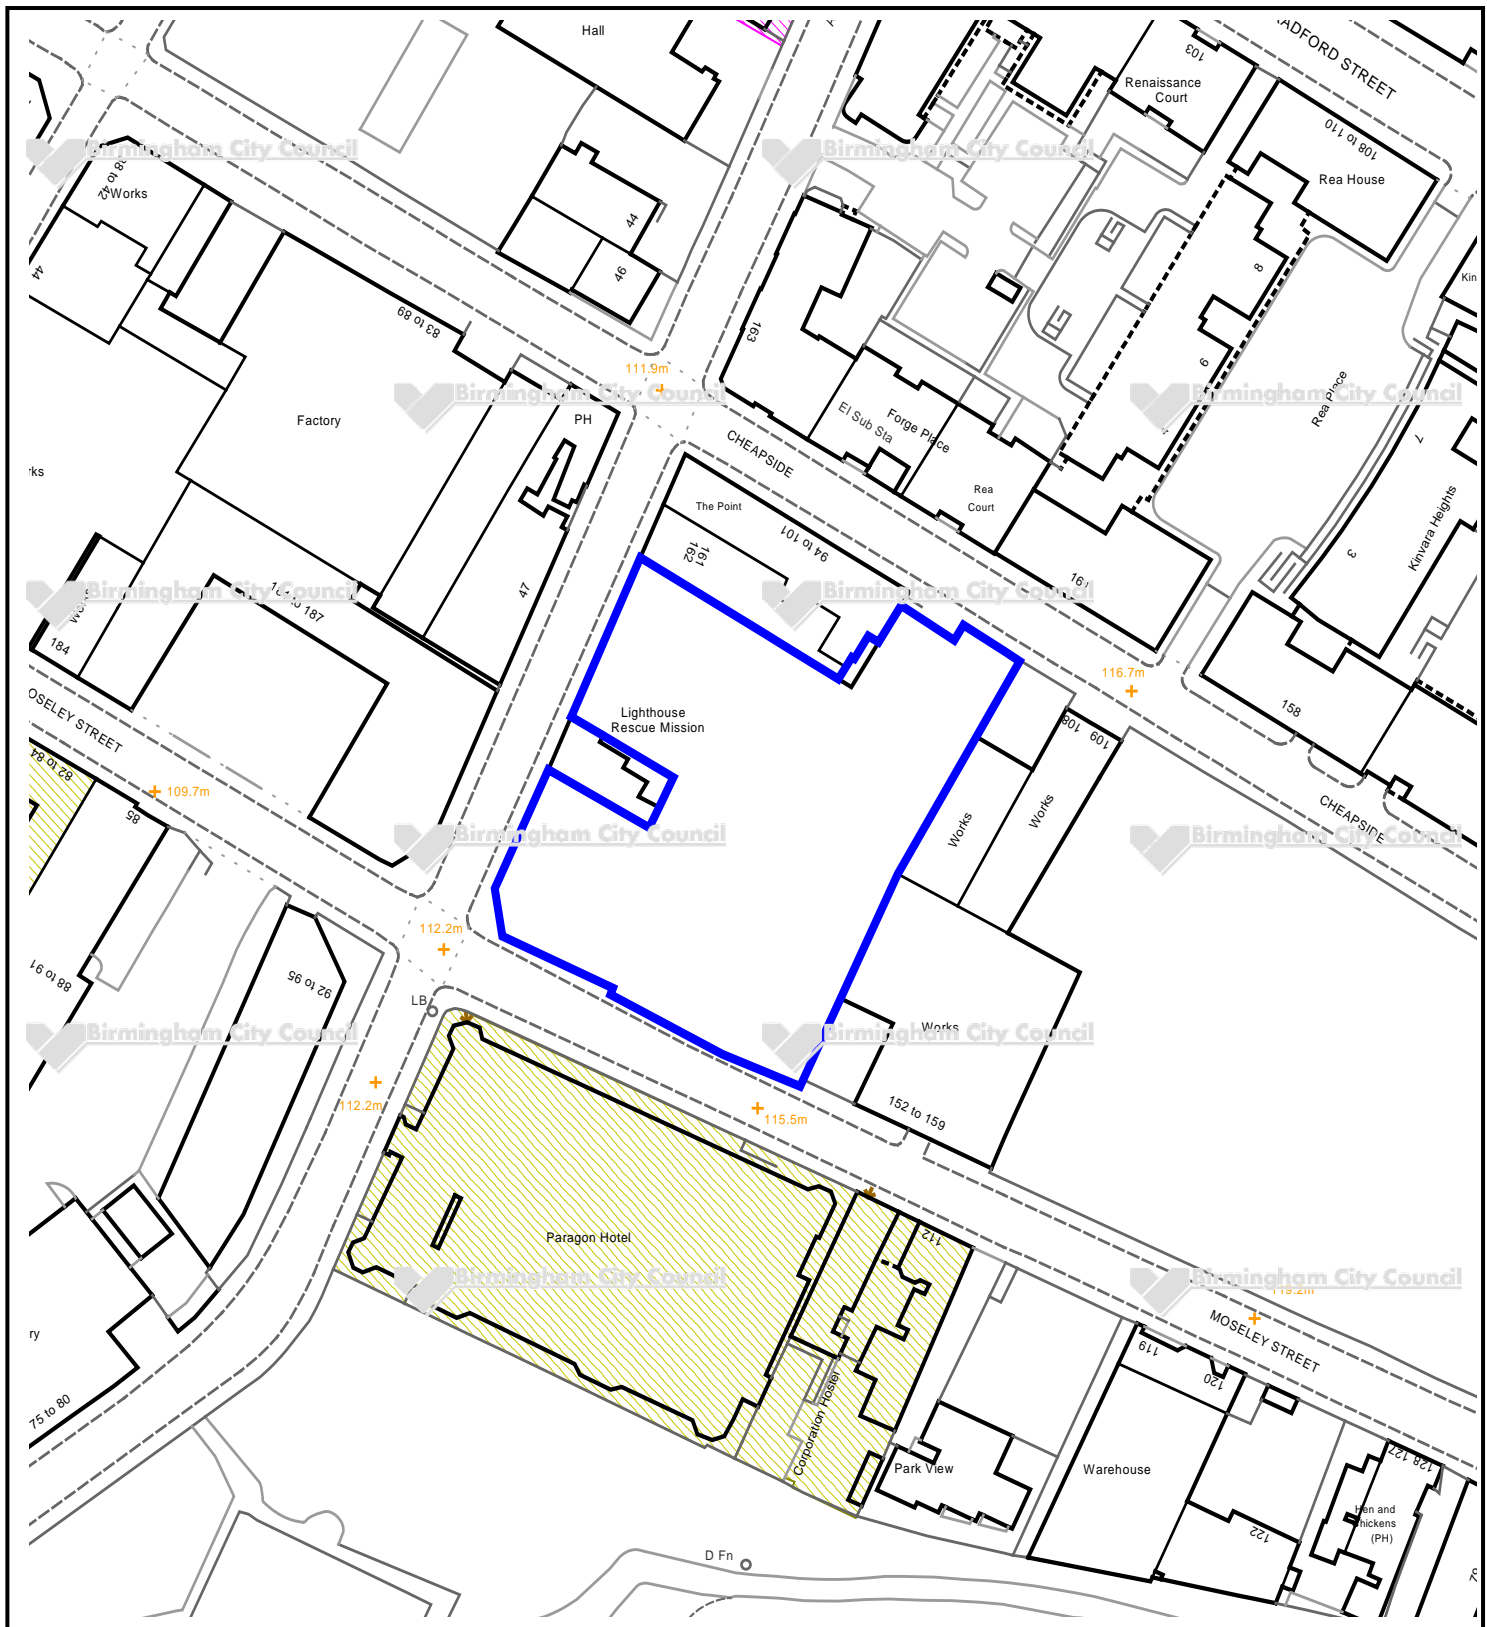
Application Site – Corner of Moseley Street and Alcester Street
